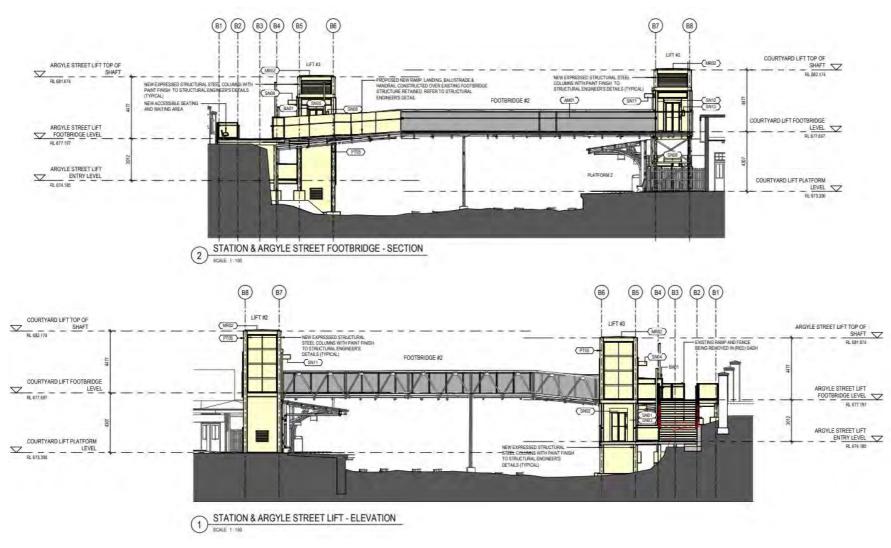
Argyle street footbridge section and elevation (Architectus, drawings dated 19/1/24)
